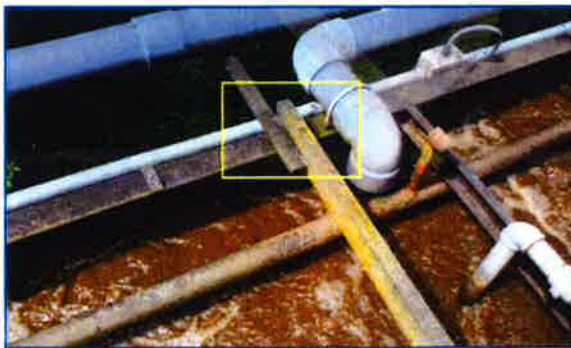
Overview of the single excavation made on the Western side of the wastewater aeration tank. This was located at 41' from the North tank end.
